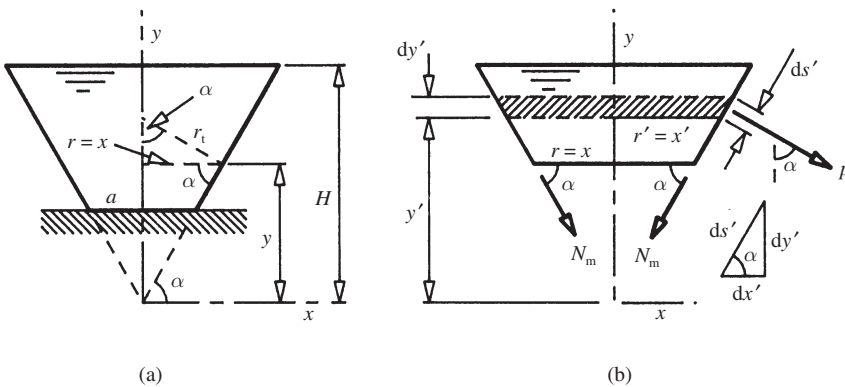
(a) Conical tank example. (b) Frustum of the tank
